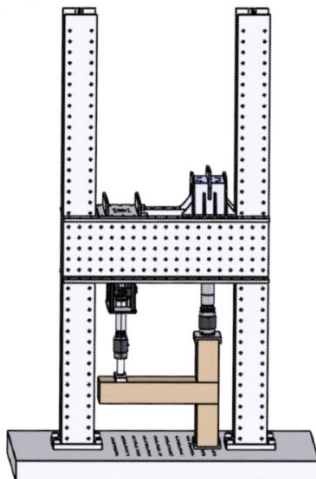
Test setup for the wall-floor-wall connection in the steel load frame.
